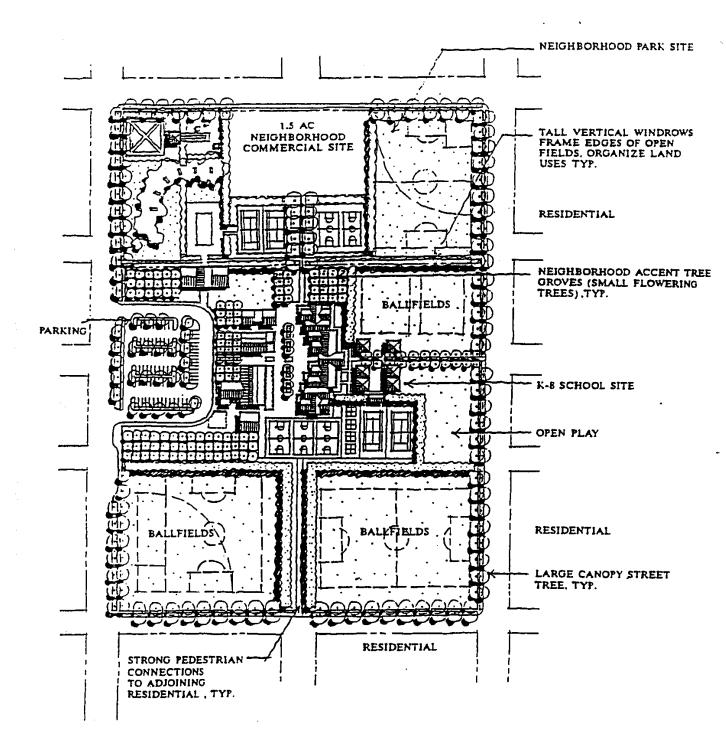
FIGURE vi – TYPICAL NEIGHBORHOOD SCHOOL AND PARK LAYOUT
